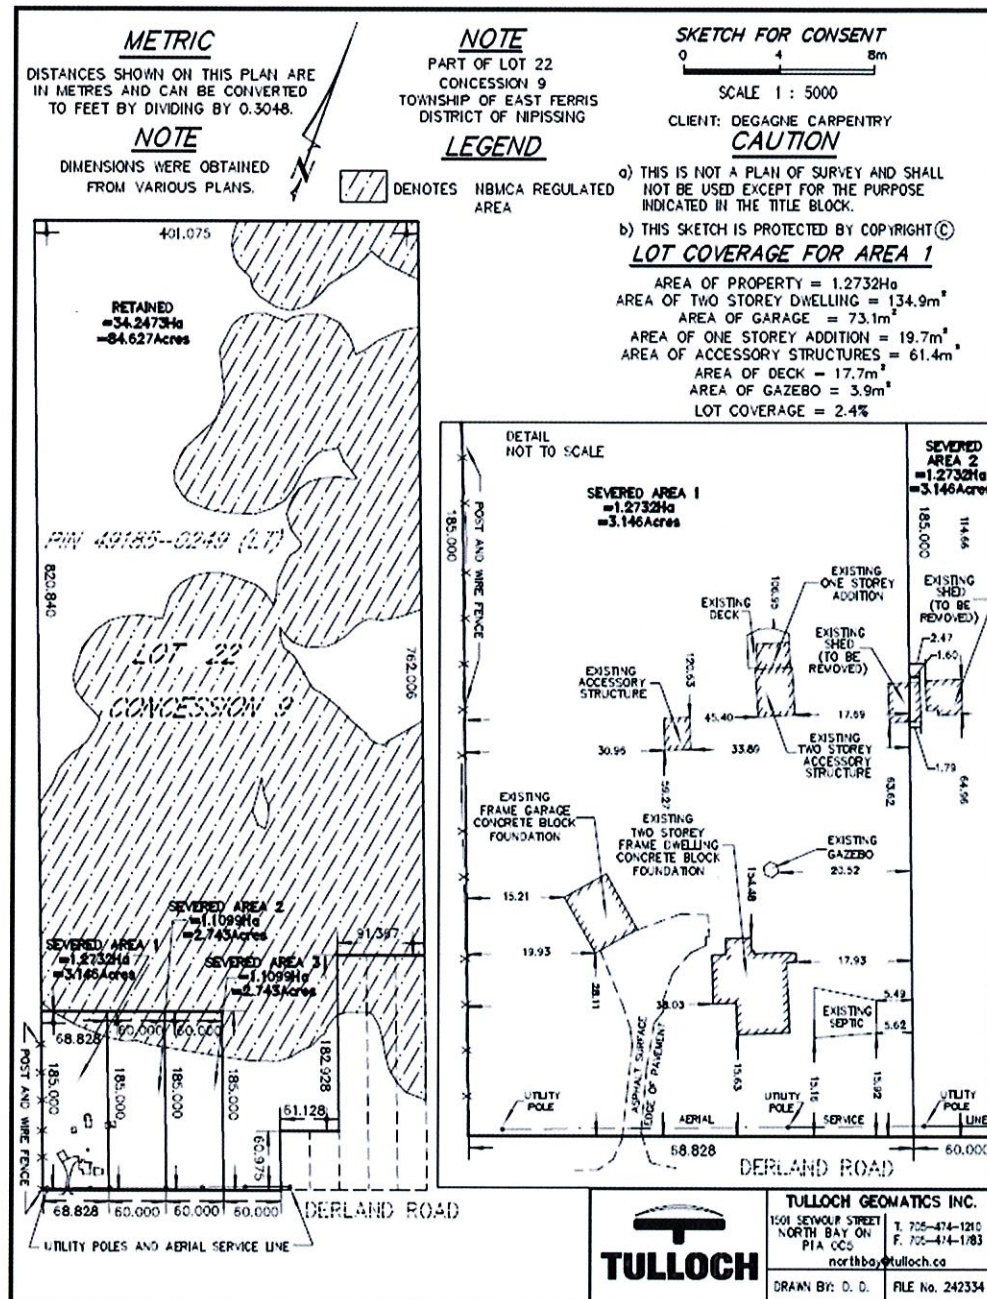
Severance sketch showing proposed new lots (3) plus retained
